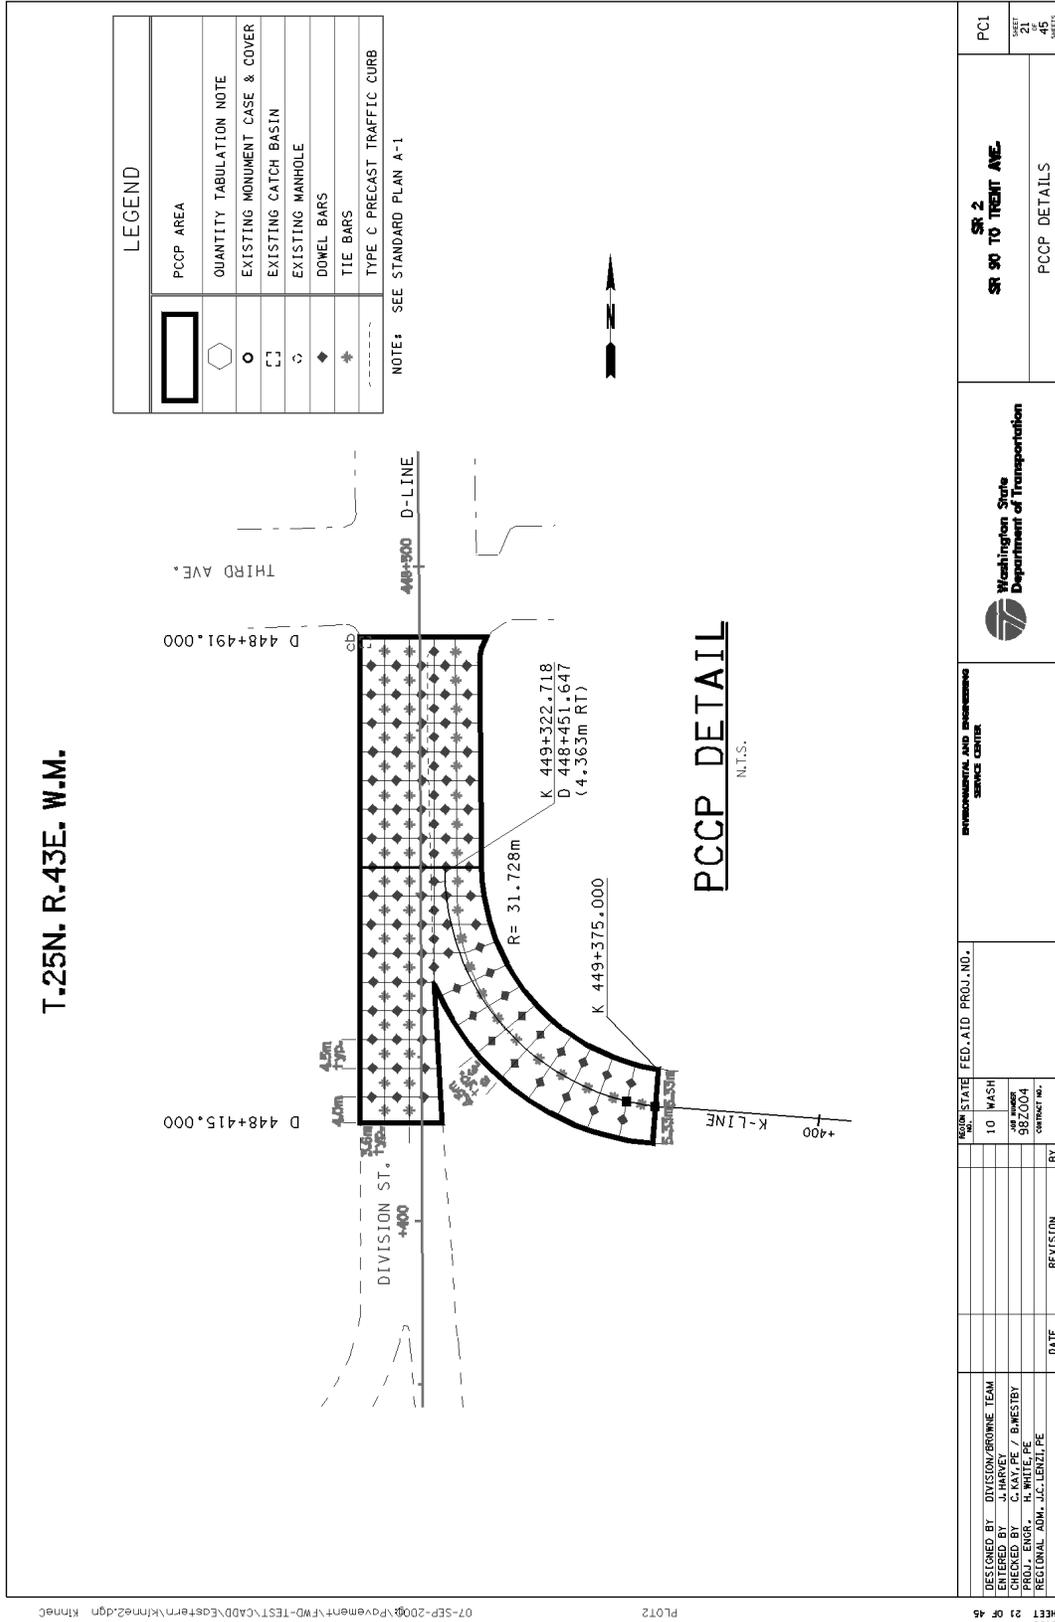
SR 2, Division Street to Third Avenue – revised jointing plan.
